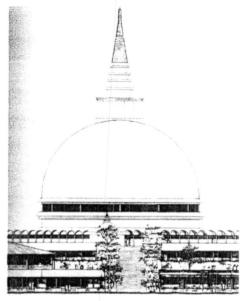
Kaluthara stupa, very modern stupa, with same proportion, shape and detailing to stupa at plate 2.1. (Source: The Sri Lanka Architect, Vol. 101, no 19, p19)
